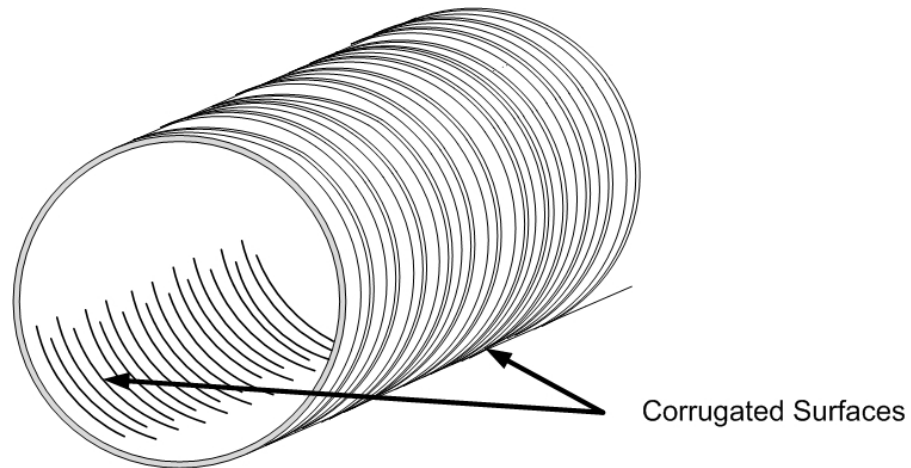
Schematic of a Single Walled Plastic Culvert
